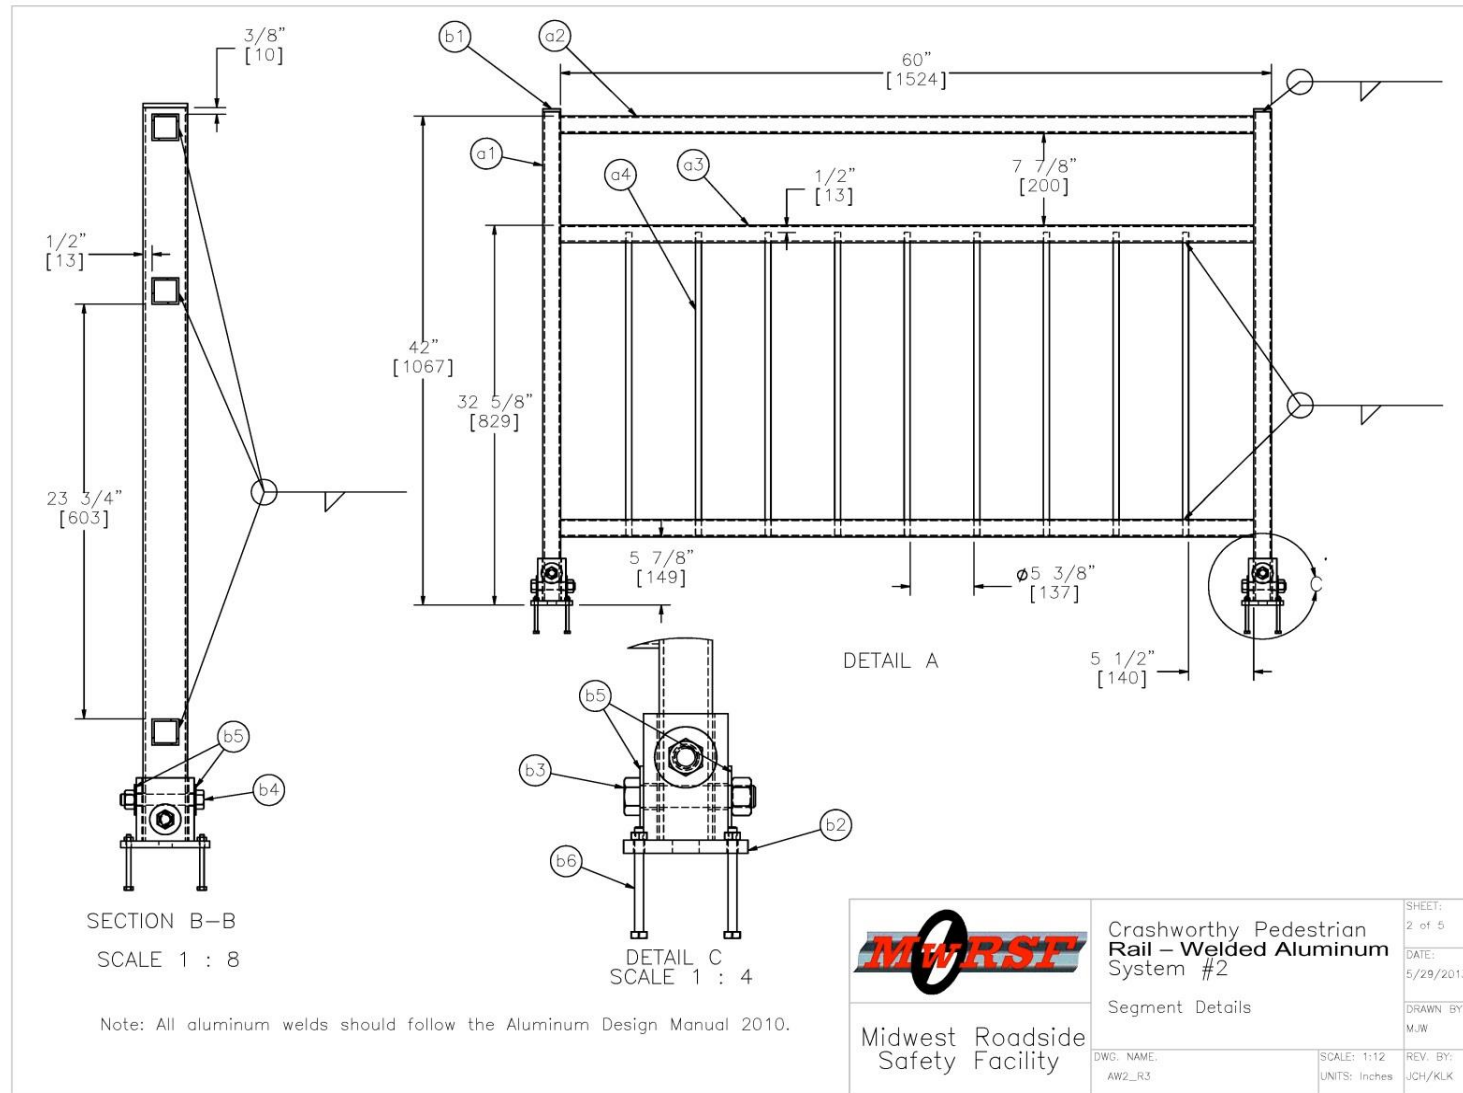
Welded Aluminum Rail, Design Concept AW2 (Sheet 2 of 5)
